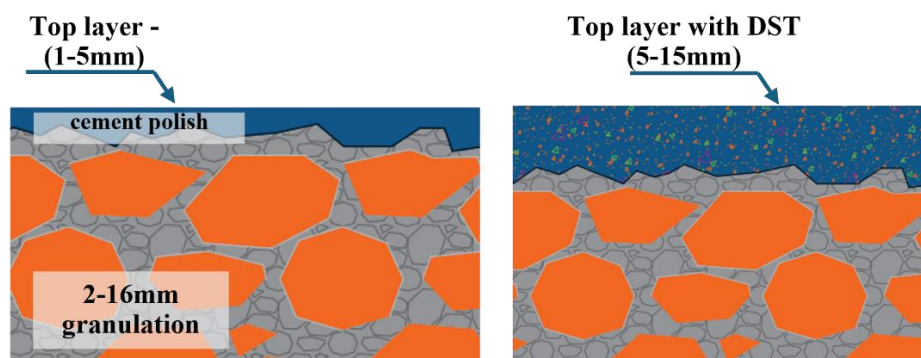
Section through an example of an industrial concrete floor with and without surface zone improvement with DST hardener.
